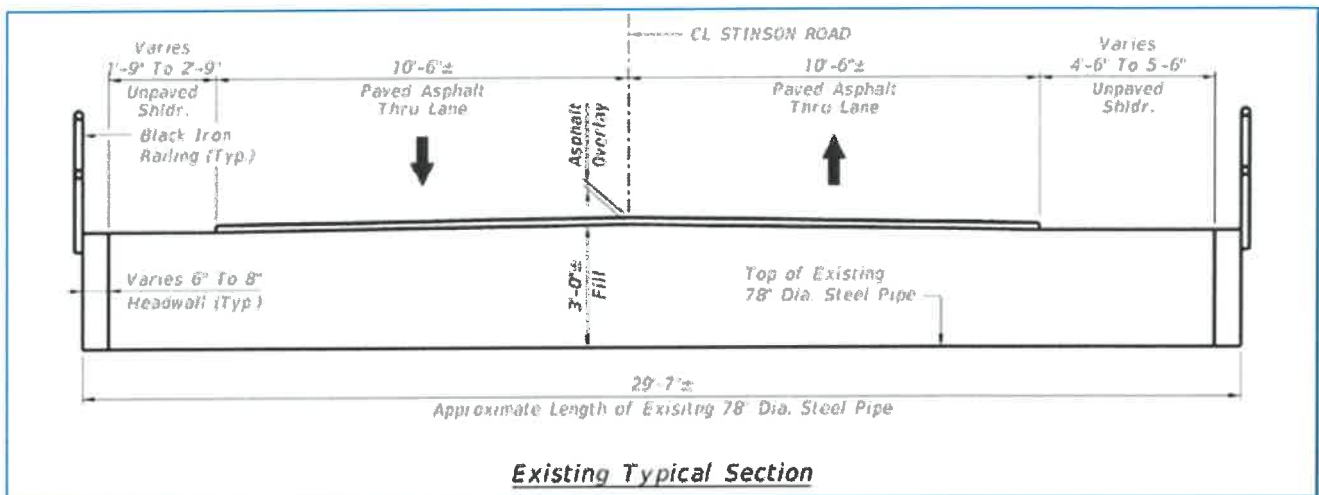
Stinson Rd Typical Section at Muddy Creek
